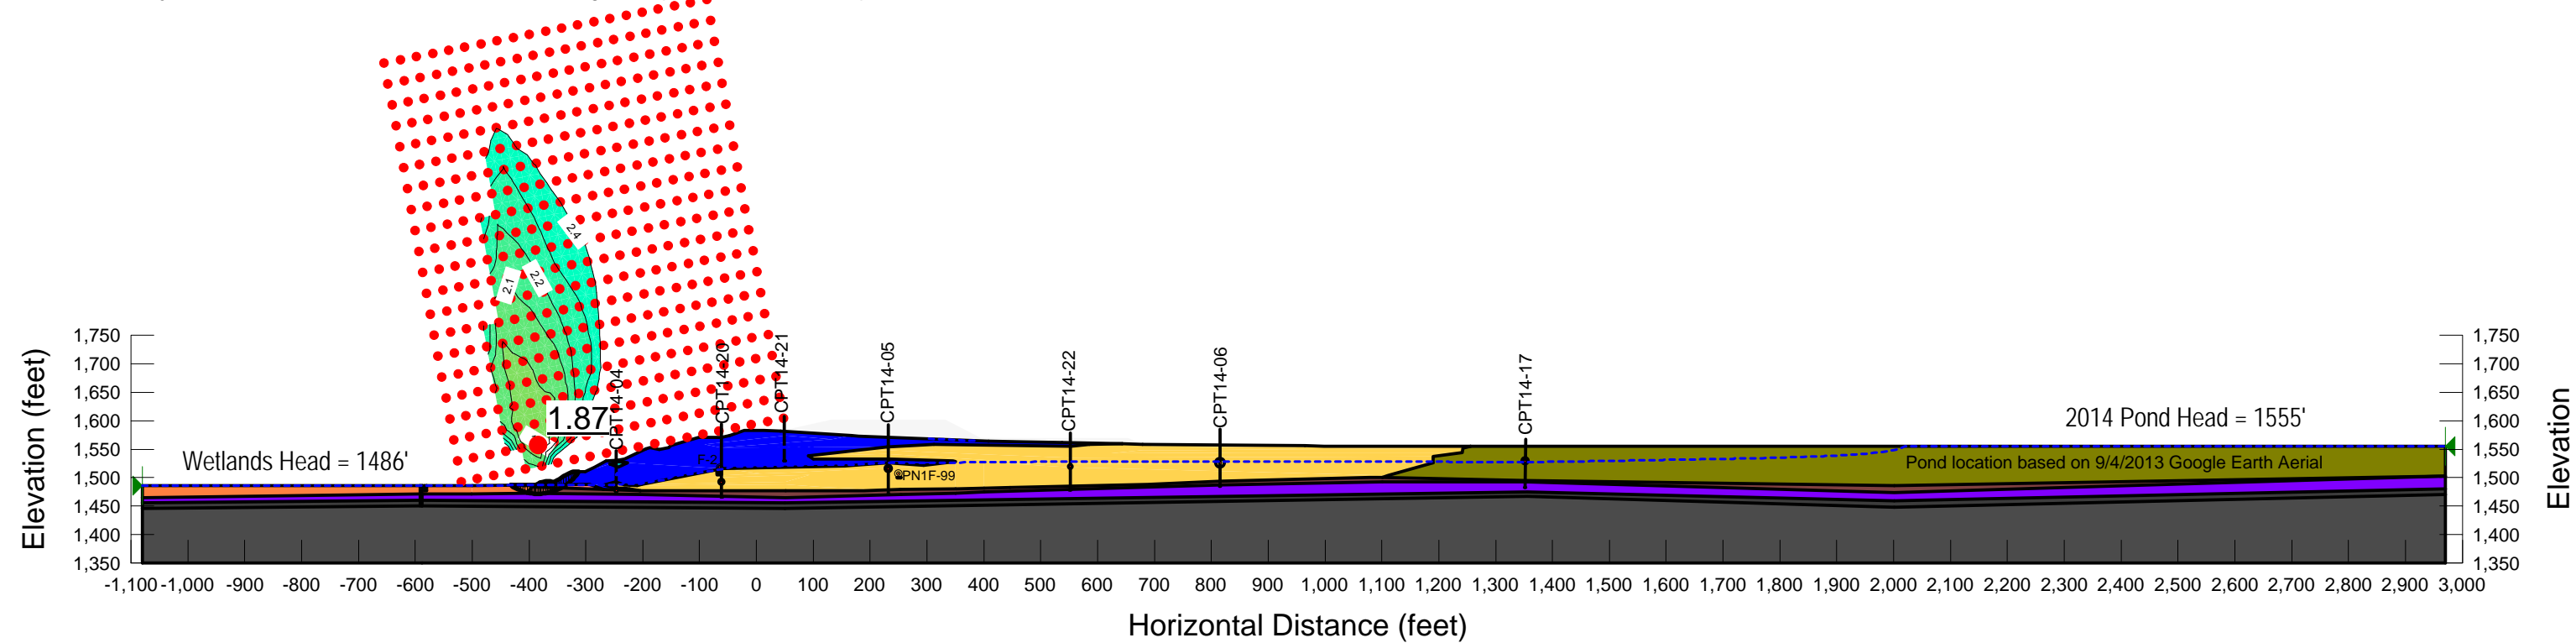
Existing ESSA Conditions\_Inactive Collection System
